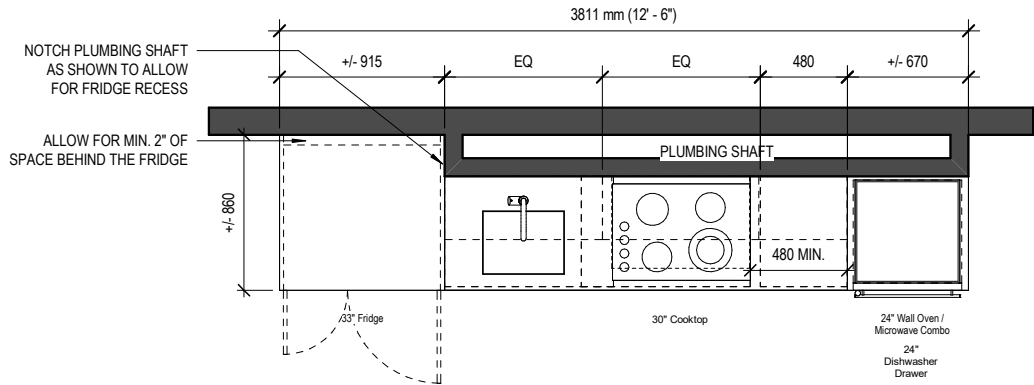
Typical Kitchen & Kitchen Island Plan
